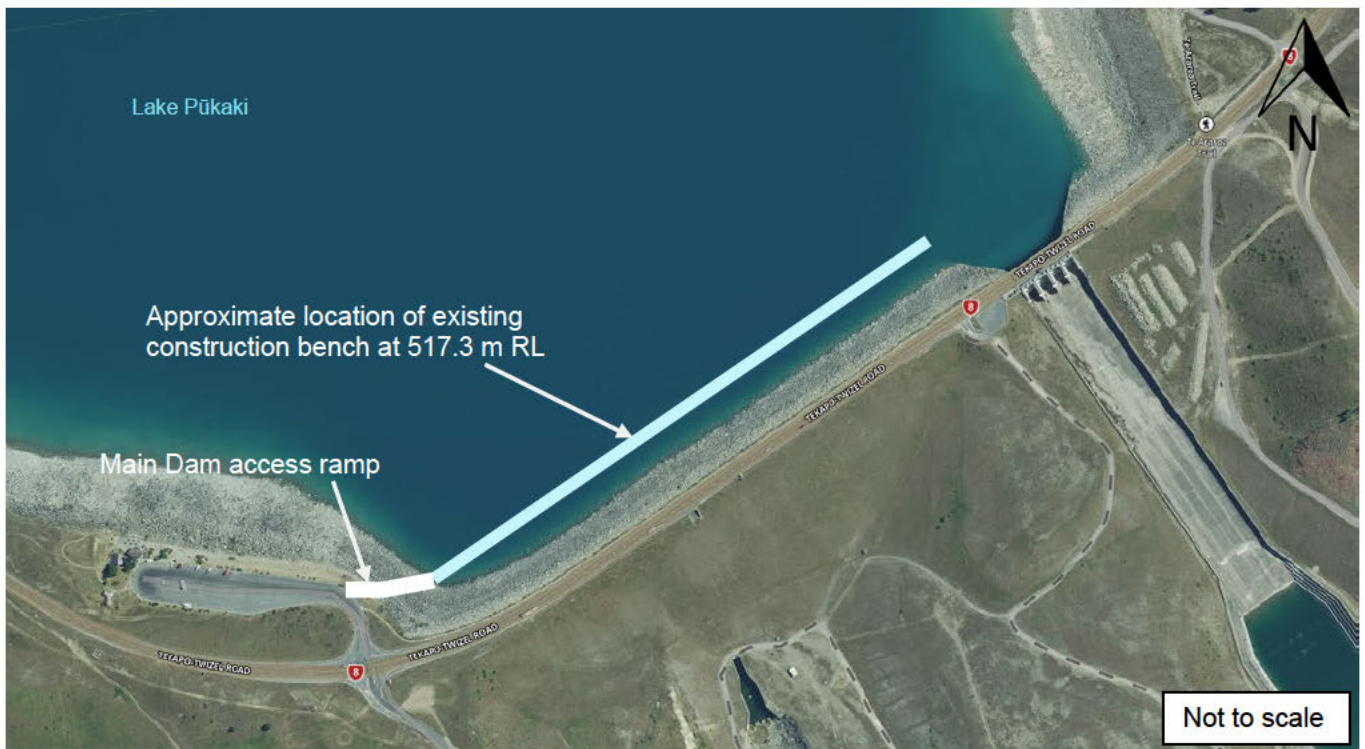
Site plan (Main Dam) and indicative 517.3 m RL construction bench
